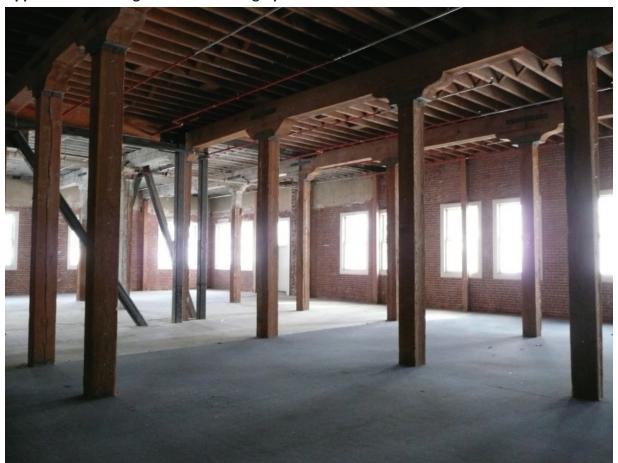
View of second floor interior, looking northeast (Architectural Resources Group, October 2011).
